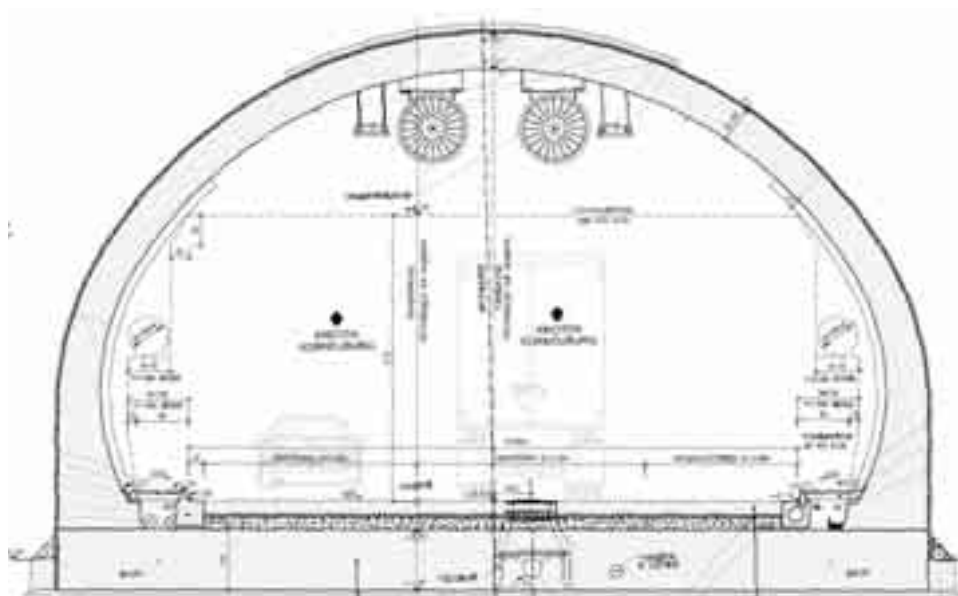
Cross section of a cut and cover tunnel with concrete pavement
